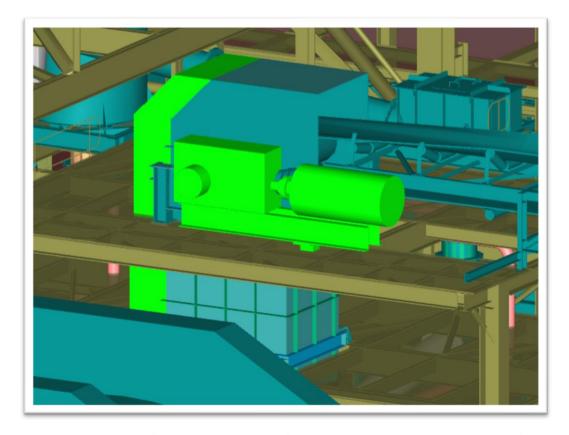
Installation of bigger drive on mill feed conveyor and minor chute modifications
